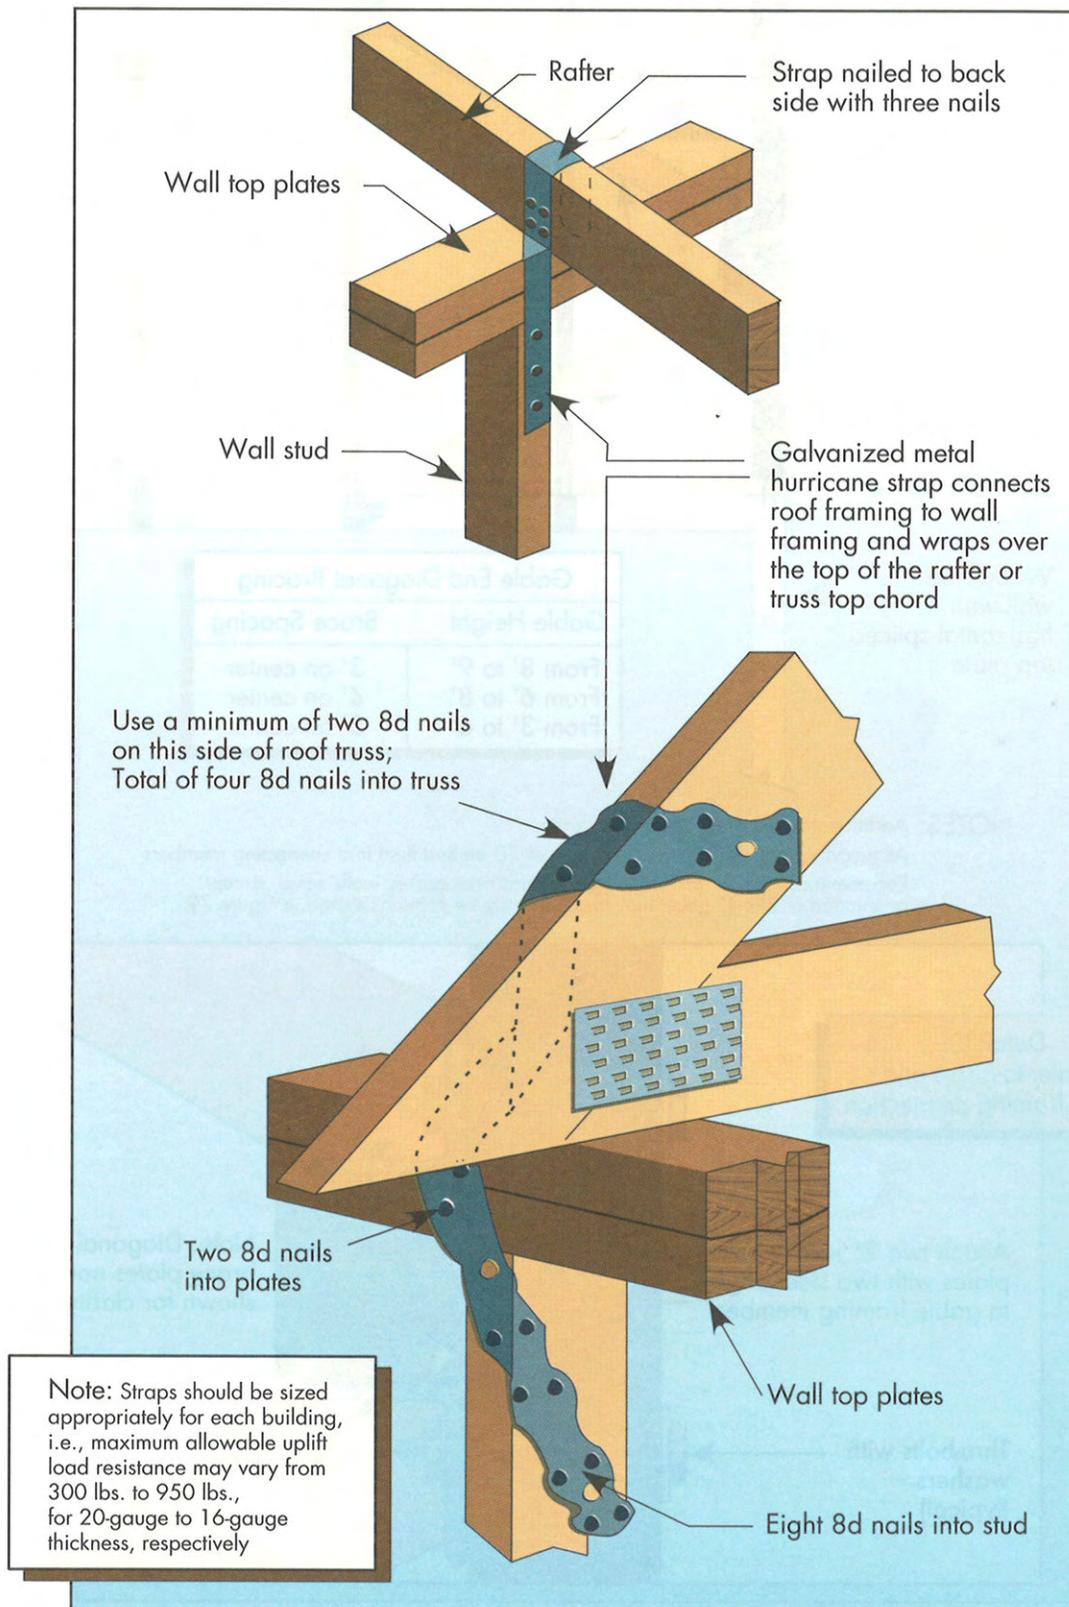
Typical hurricane strap to roof framing detail. Rafter or prefabricated roof truss.
